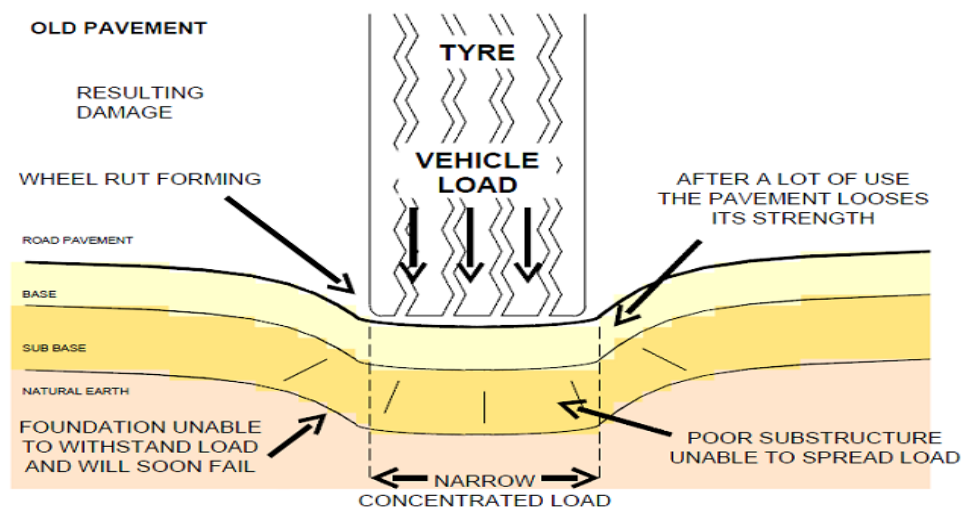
Schematic of Pavement Deformation (LGAM, 2014)
